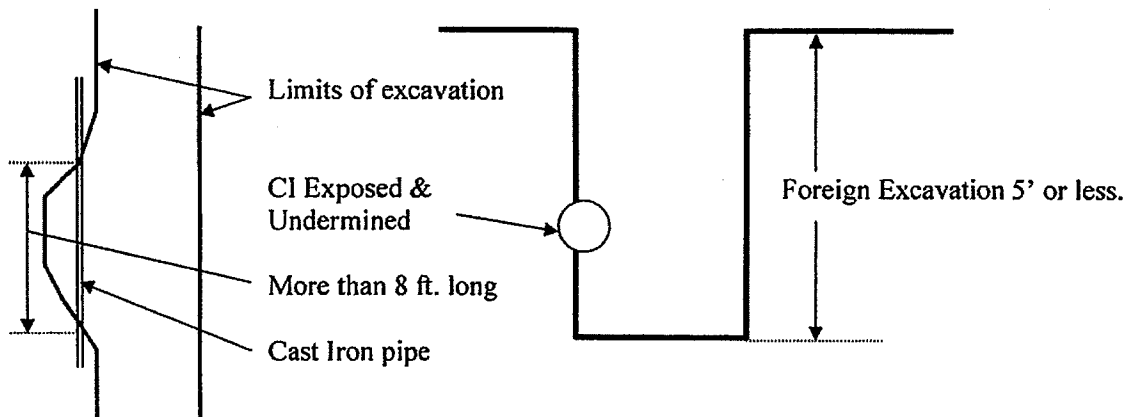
Construction Running Parallel or Adjacent to Cast Iron Mains - Shallow Trench Construction
